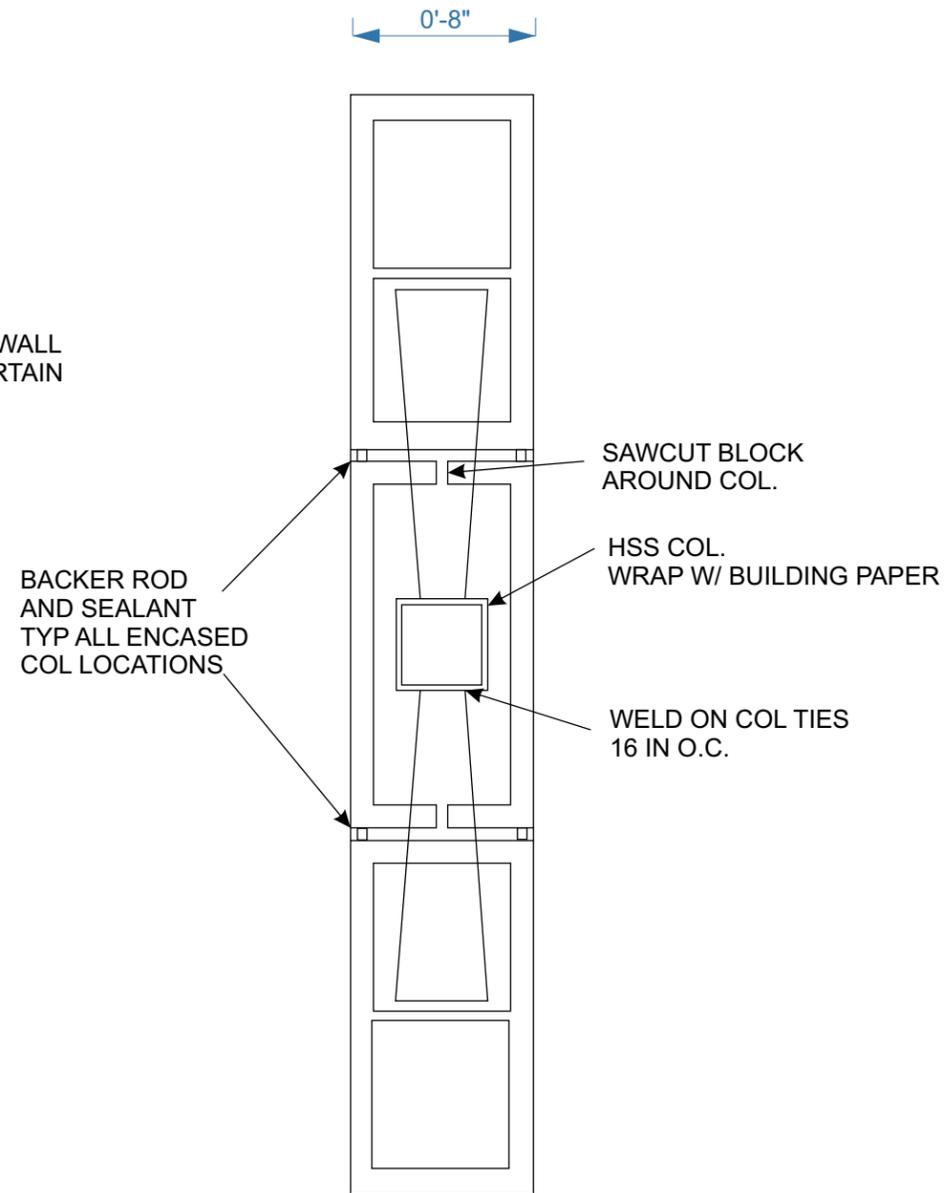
S6 PLAN @ COLUMN LOCATIONS
